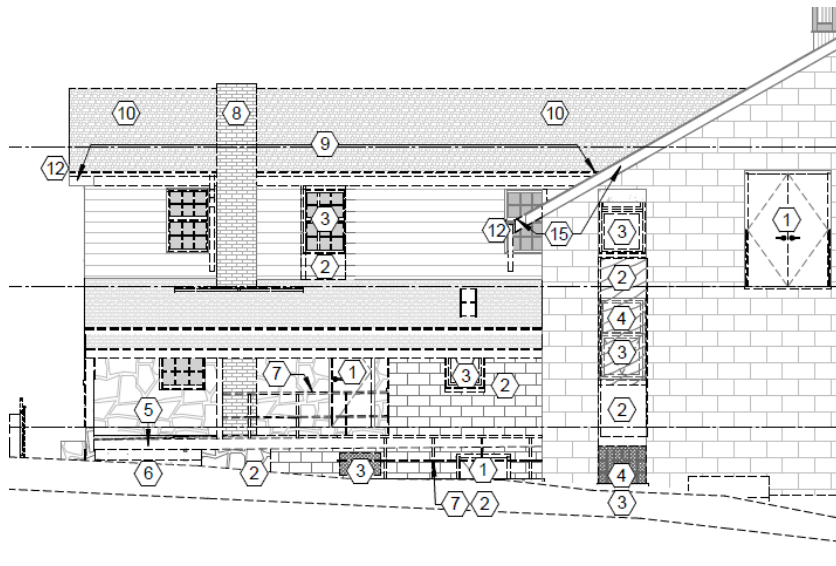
Proposed demolition plan of 1952 addition shown in dashed line.
